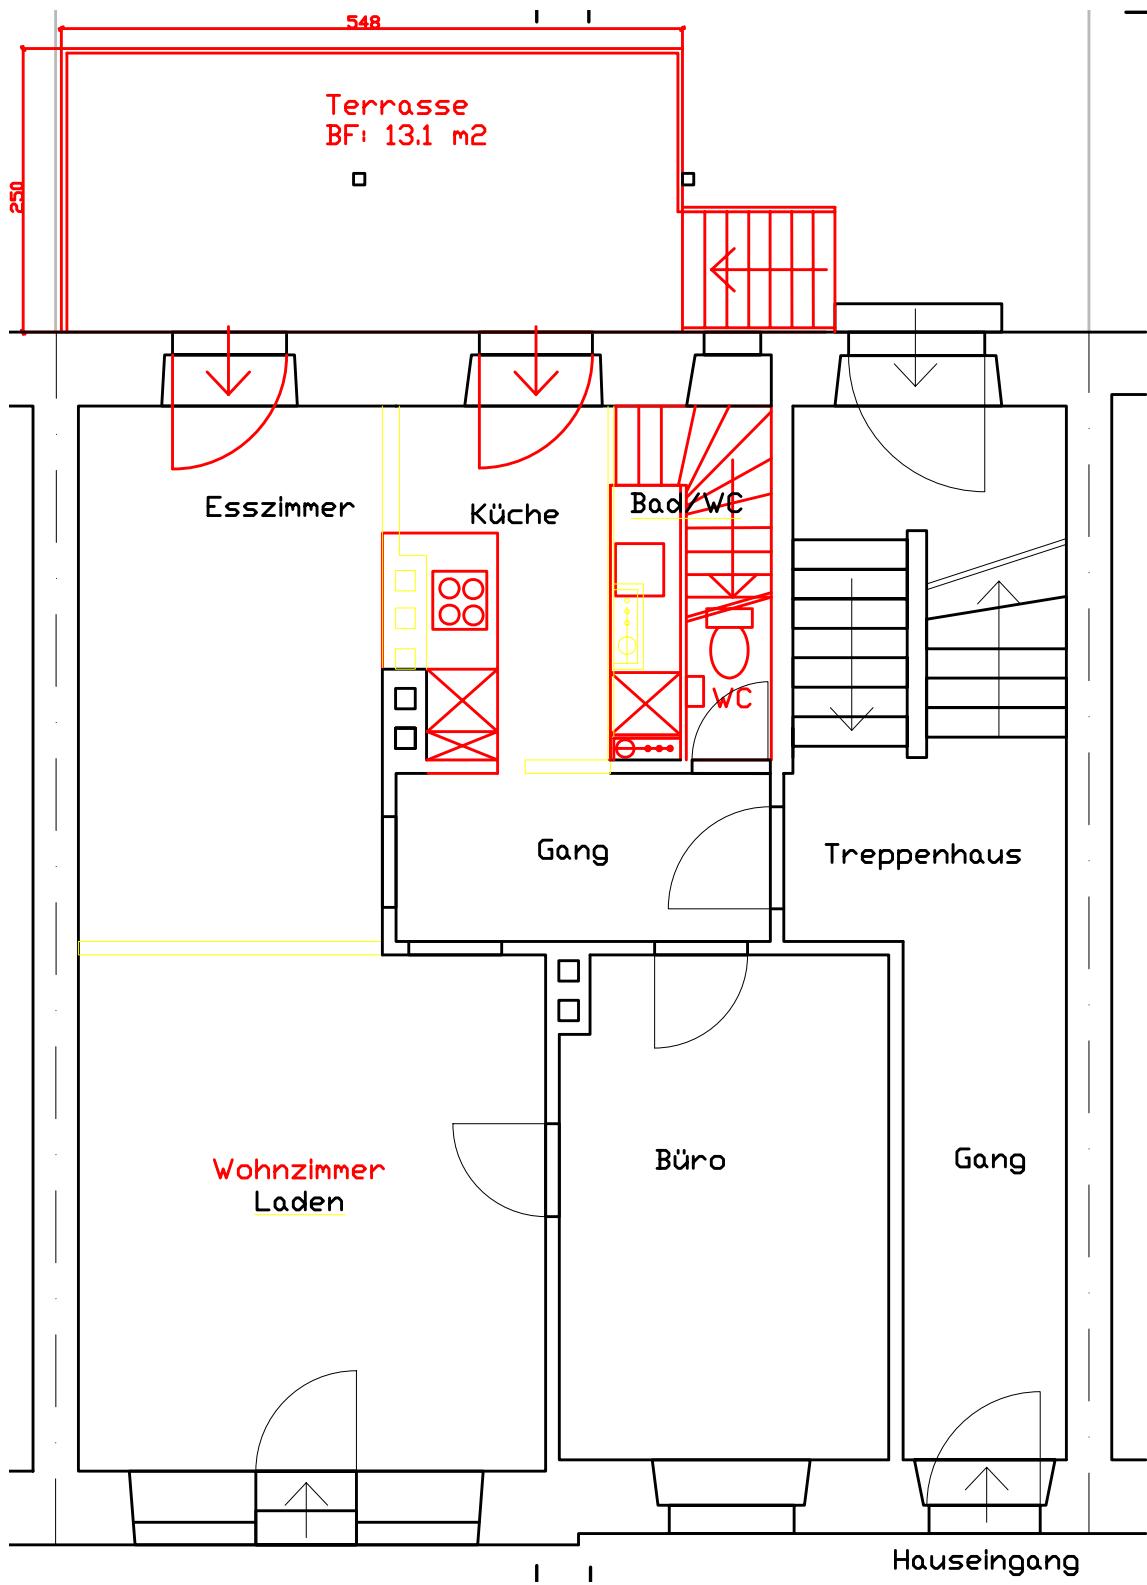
Floor plan of residential building (Hongger) ground - 1st floor
